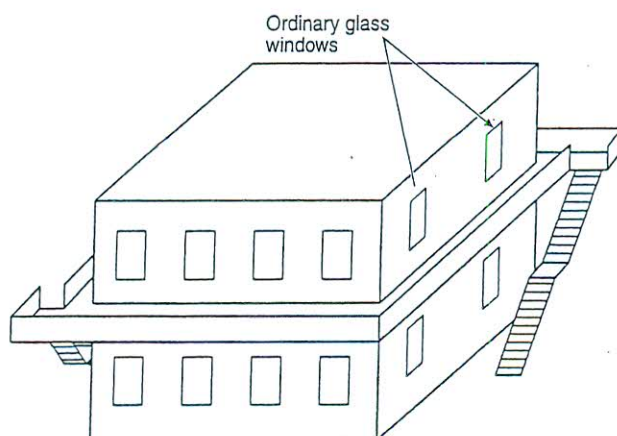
Outside Stairs Providing Direct Exits to the Outside for All Rooms in a Multistory Building. There are no interior corridors through which smoke and flame could spread.
